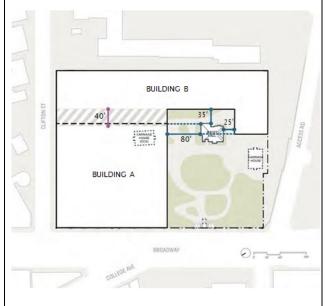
Setback zones surrounding Macky Hall and Carriage House
